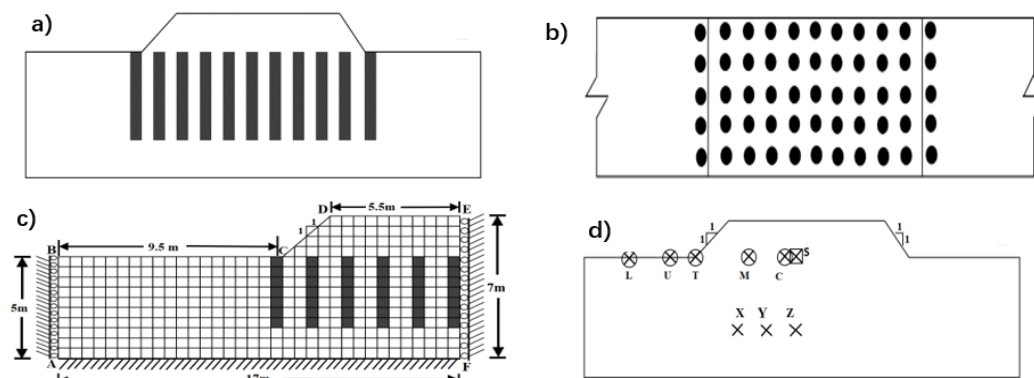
(a) Cross-sectional elevation of the embankment and soft foundation soil with lime columns, (b) plane at just below ground level in soft foundation soil with lime columns, (c) Finite element discretization of embankment and foundation soil improved with lime columns at 1.5 m spacing, and (d) salient points considered in the analysis of embankment and foundation soil.
